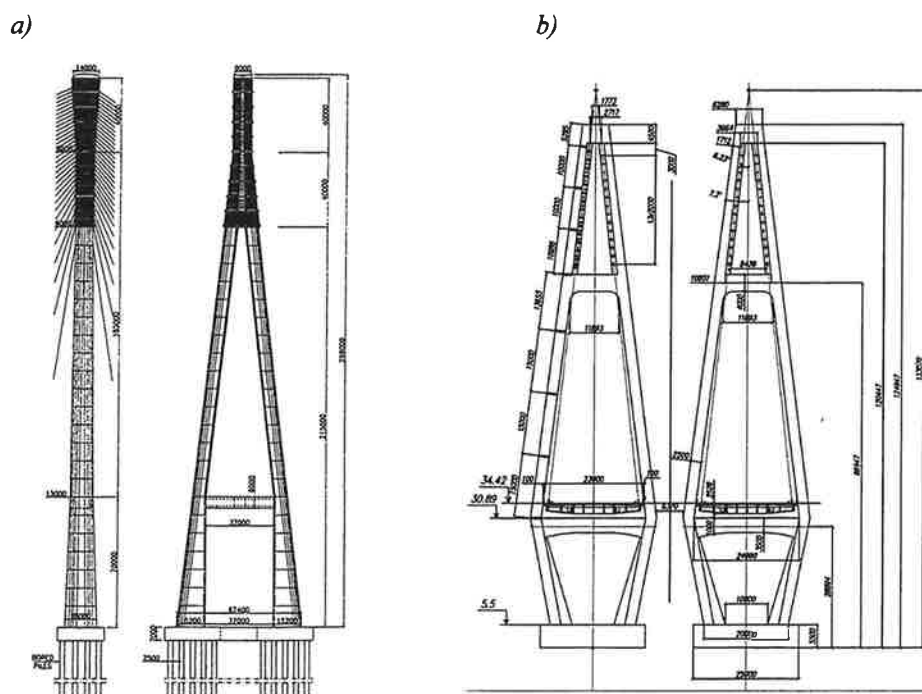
Pylons of a) the proposed Stonecutters Bridge and b) the Neva Cable-Stayed Bridge.
